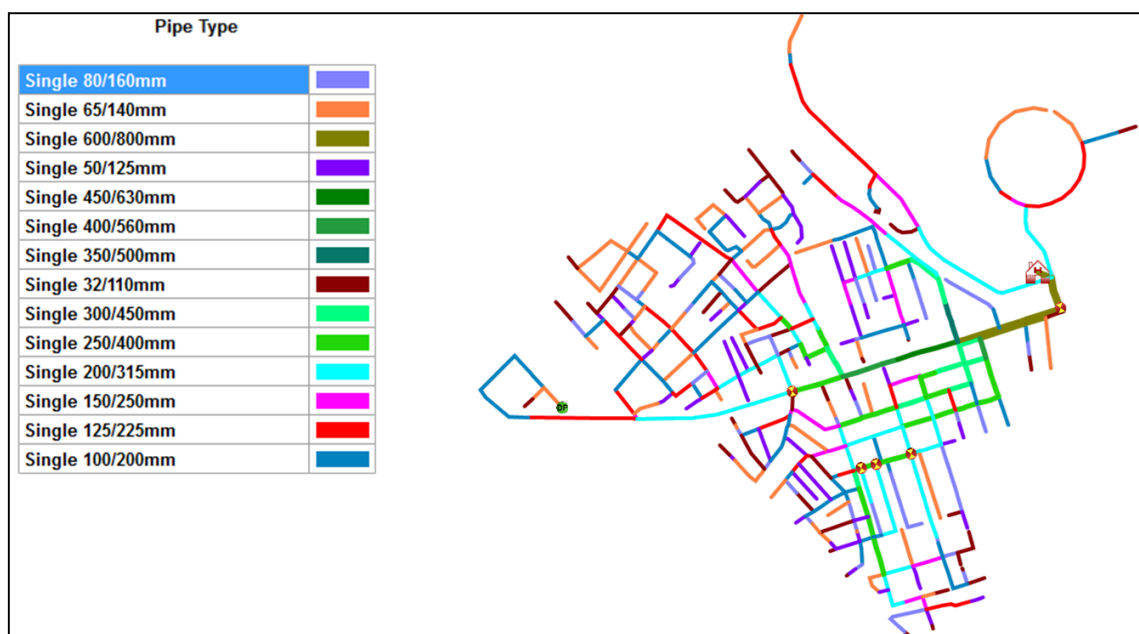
Completed pipeline dimensioning for CZ 148 Westminster.
